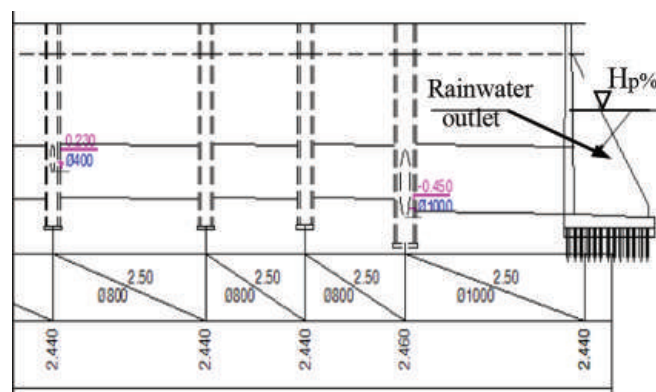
Rainwater Outlet flooded 1 - 2 m below designed flood level ($H_p\%$) [3]
